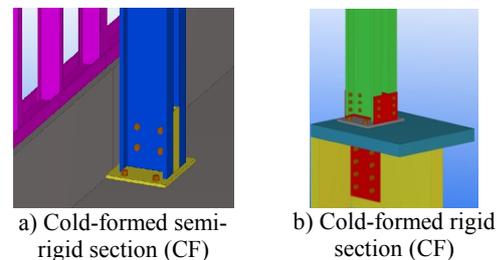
Proposed connections for steel over-roofing: (a) semi-rigid; (b) rigid
